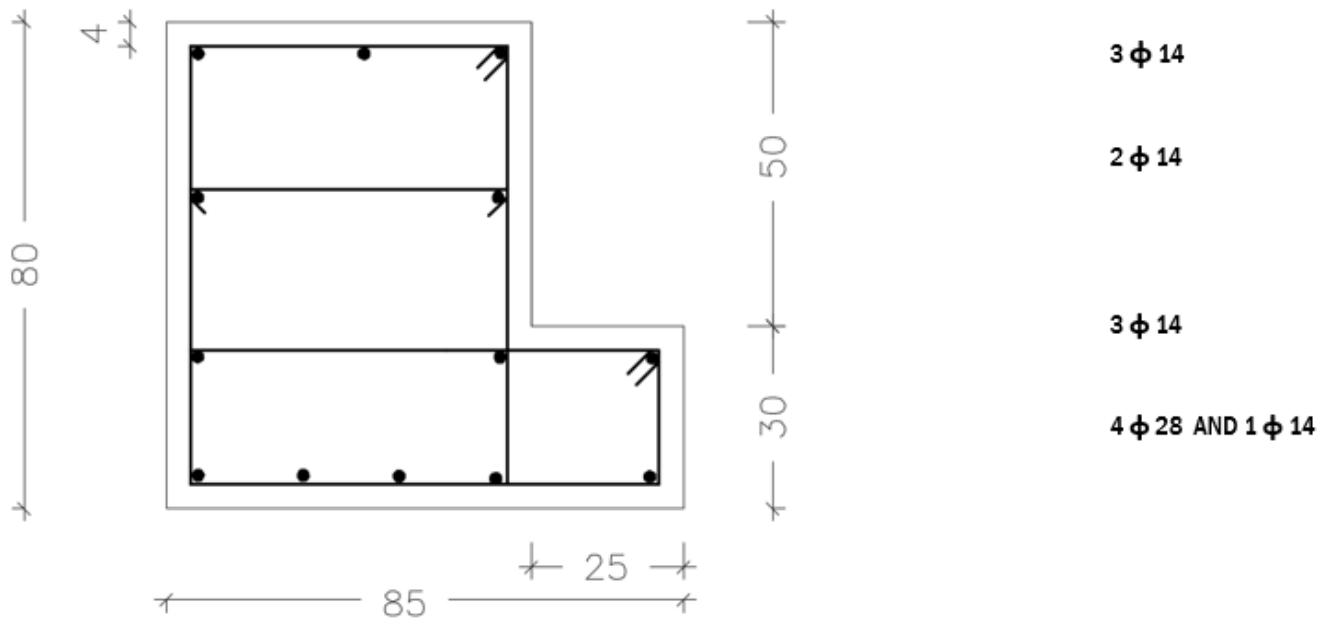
Typical Cross Section for L-Shaped Beam at Spans
